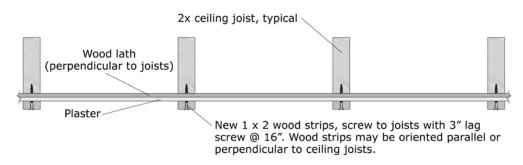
Retrofit detail for existing lath and plaster (NE).
